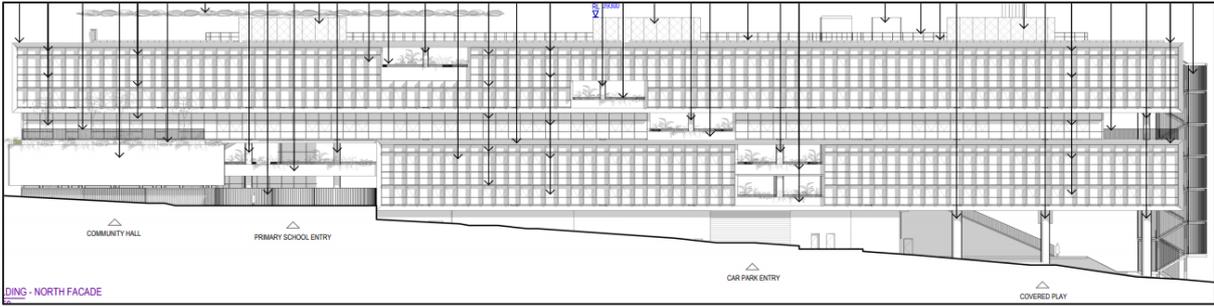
Approved northern elevation (Rhodes Street frontage) of north building (Source: Applicant's EIS 2020)
